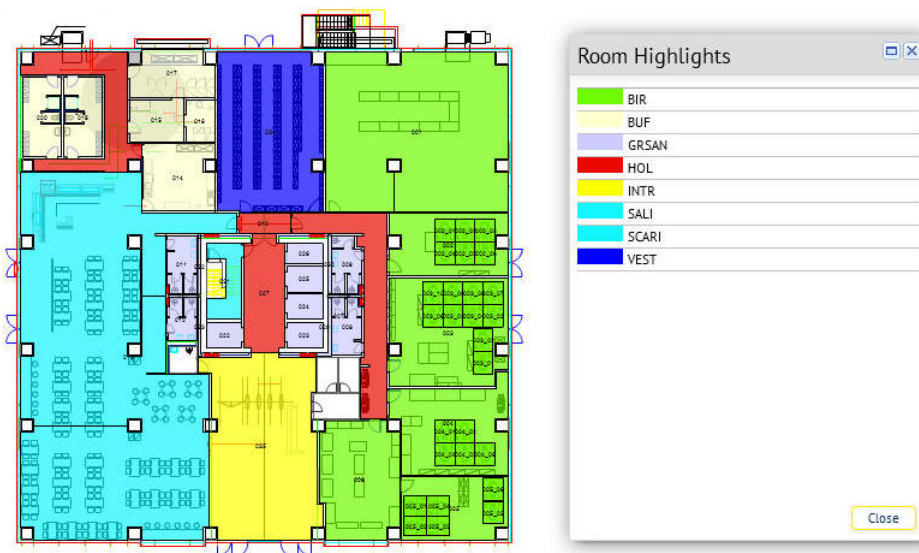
MultiGalaxy building, ground floor, space structure according to SR 1907-2
